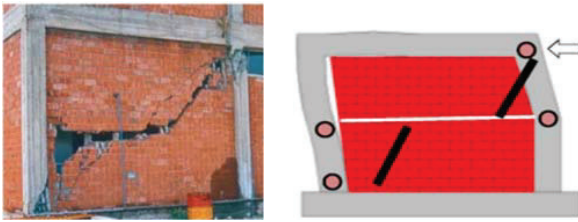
Masonry shear failure in 1999 Turkey EQ (left figure) [11], and as observed in Sen et al. [9] (right figure)
